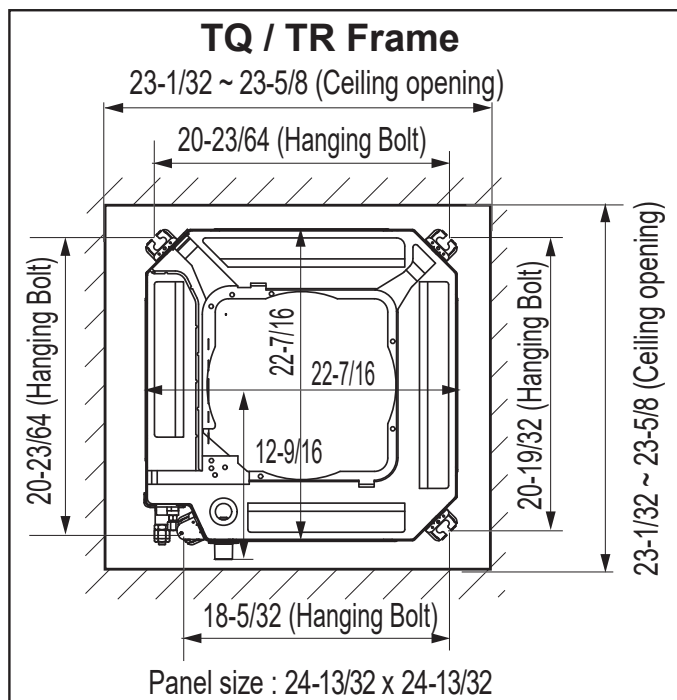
Ceiling Opening / Hanging Bolt Locations for Four-Way Ceiling Cassette Indoor Units.
